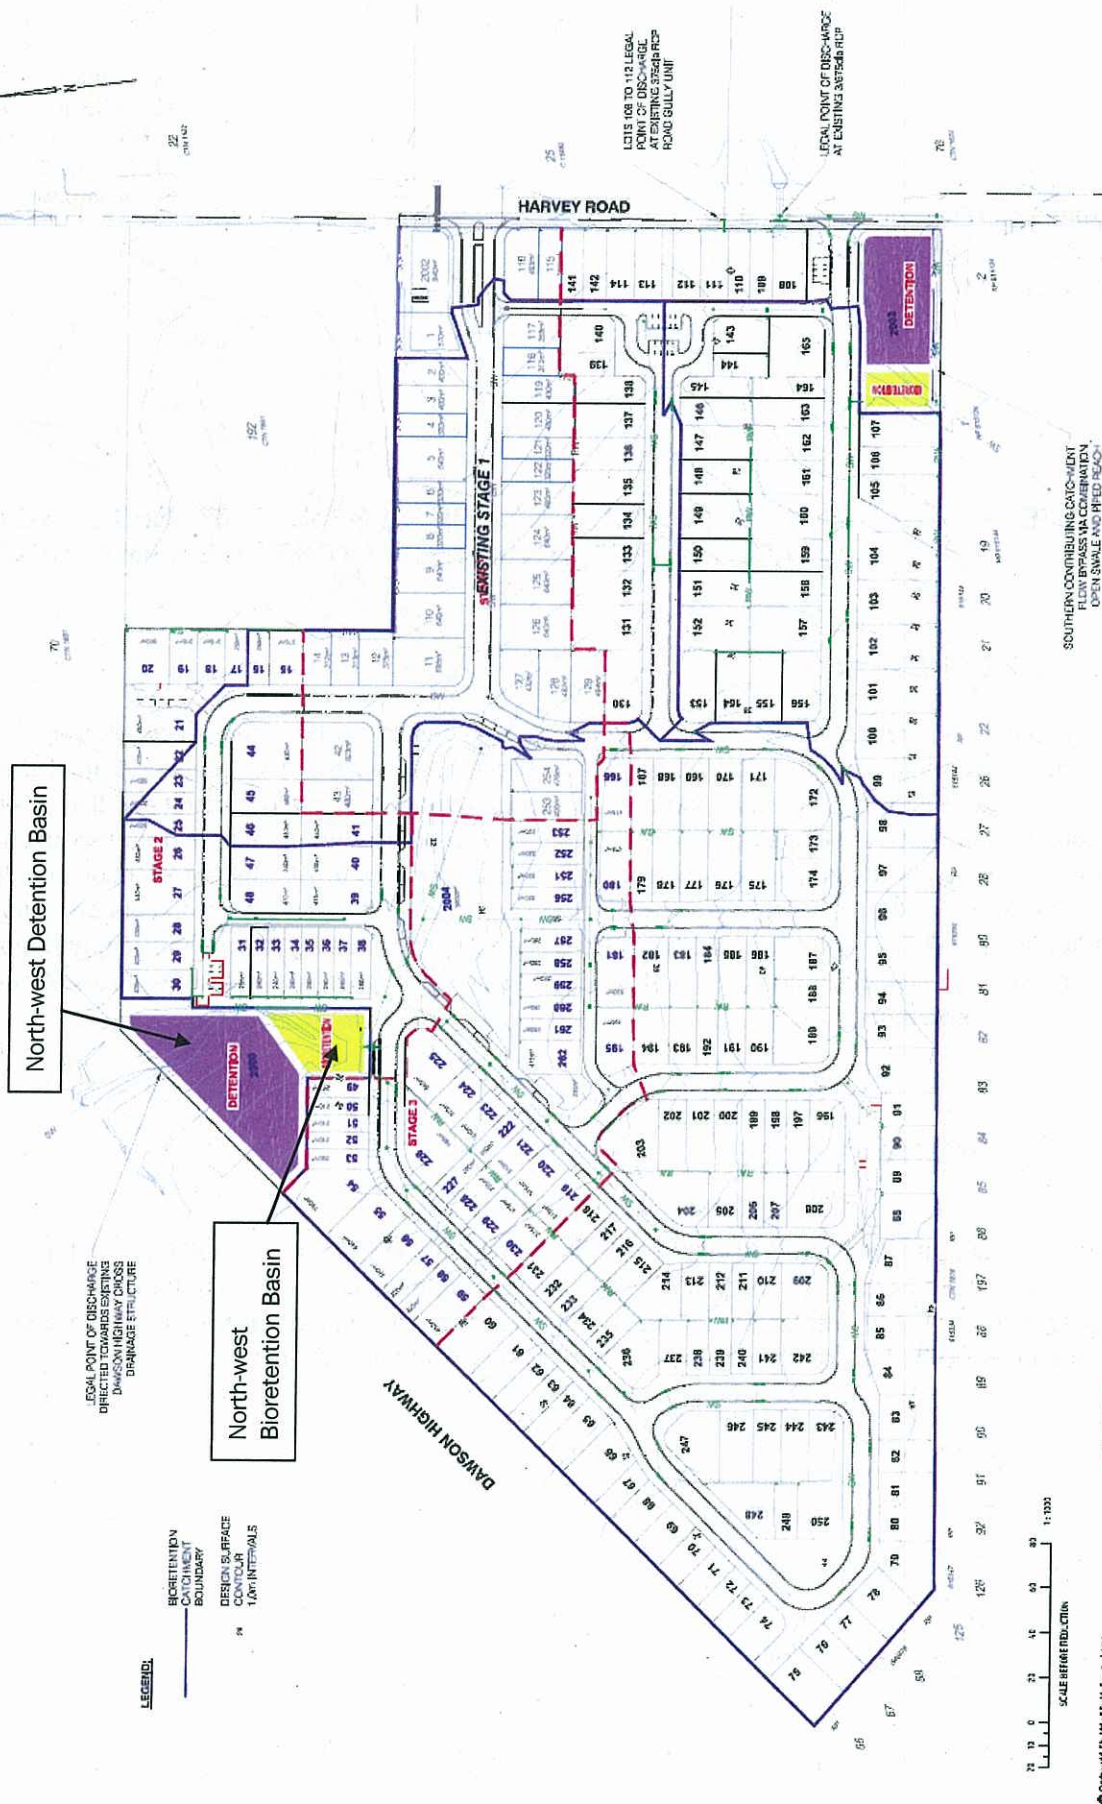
Plan Showing Location of North-west Detention and Bioretention Basins
